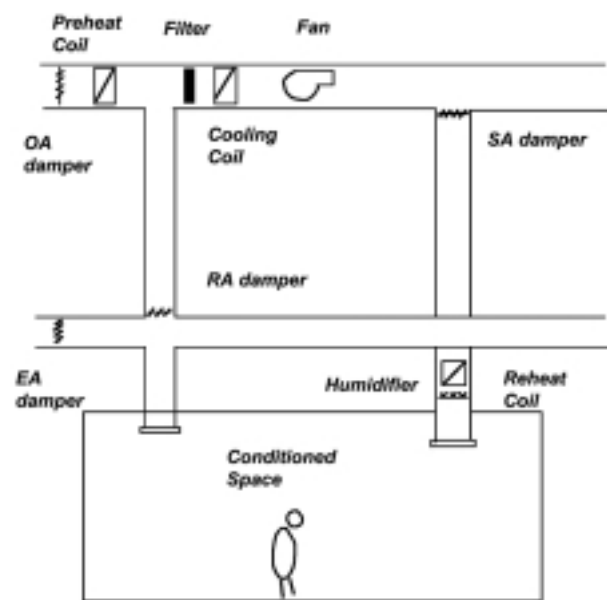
Typical Air Handling Unit (AHU) for an air HVAC system
